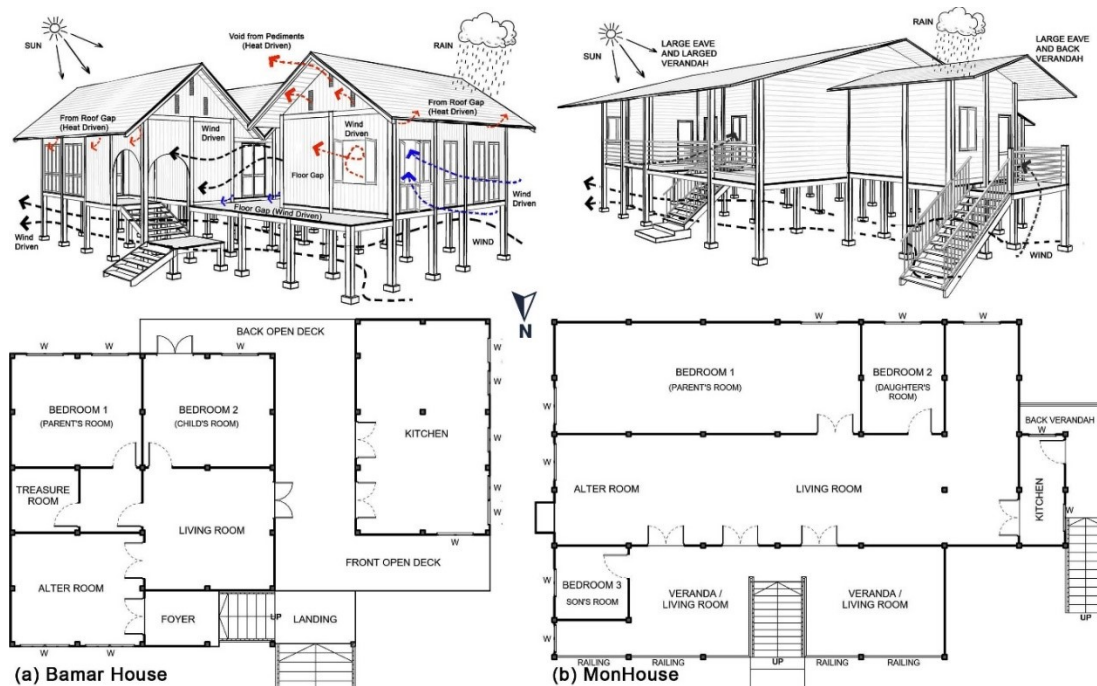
Built form and plan of Bamar house (left) and Mon house (right) in the study (Zune, 2017a)
